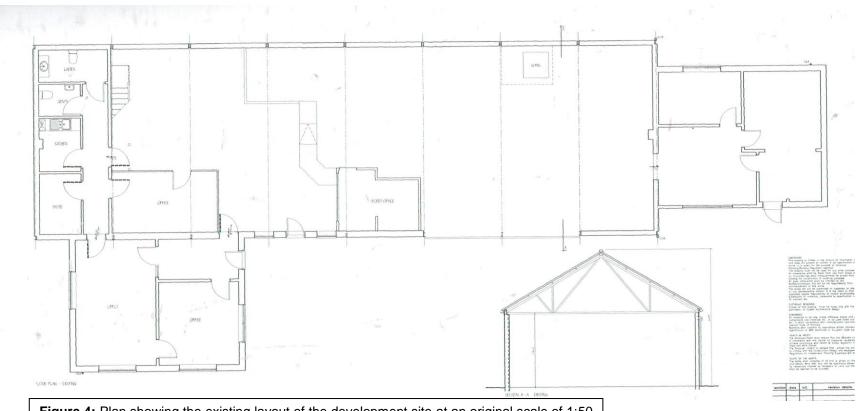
Plan showing the existing layout of the development site at an original scale of 1:50 at A1, (not to scale), (extract from Architects plan)
